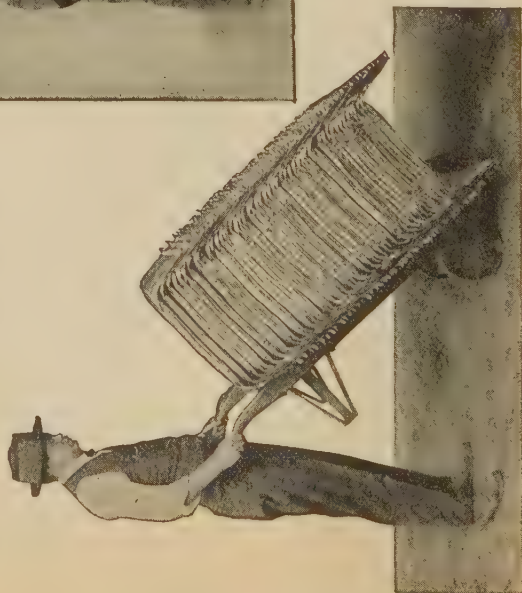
Handling Floretyles. 2. A stack of 50 Floretyles on a two-wheeled truck is equivalent in floor construction to 333 terra-cotta tiles weighing over 10,000 lbs.
